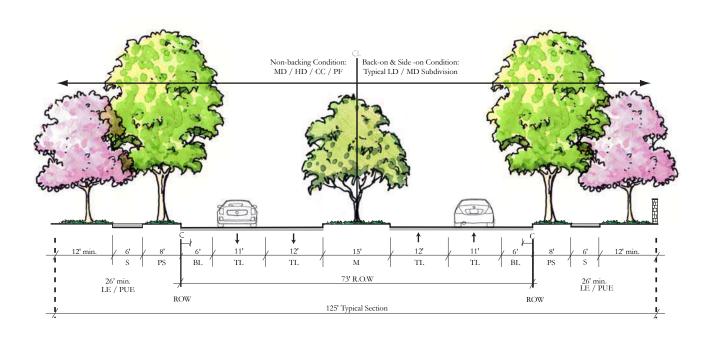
Lincoln Road / Franklin Road / George Washington Boulevard
